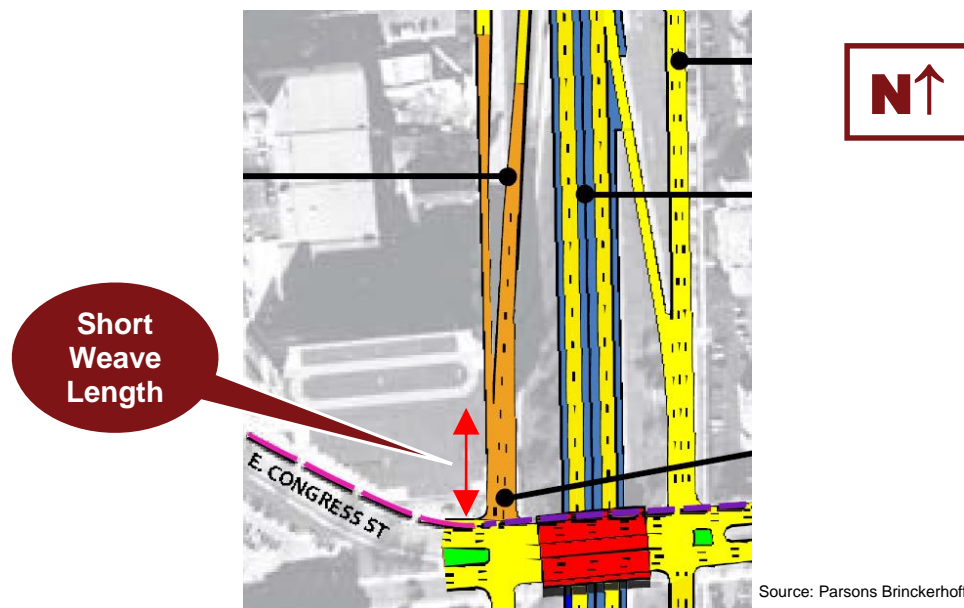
SB I-375 off Ramp Weave at Larned St
